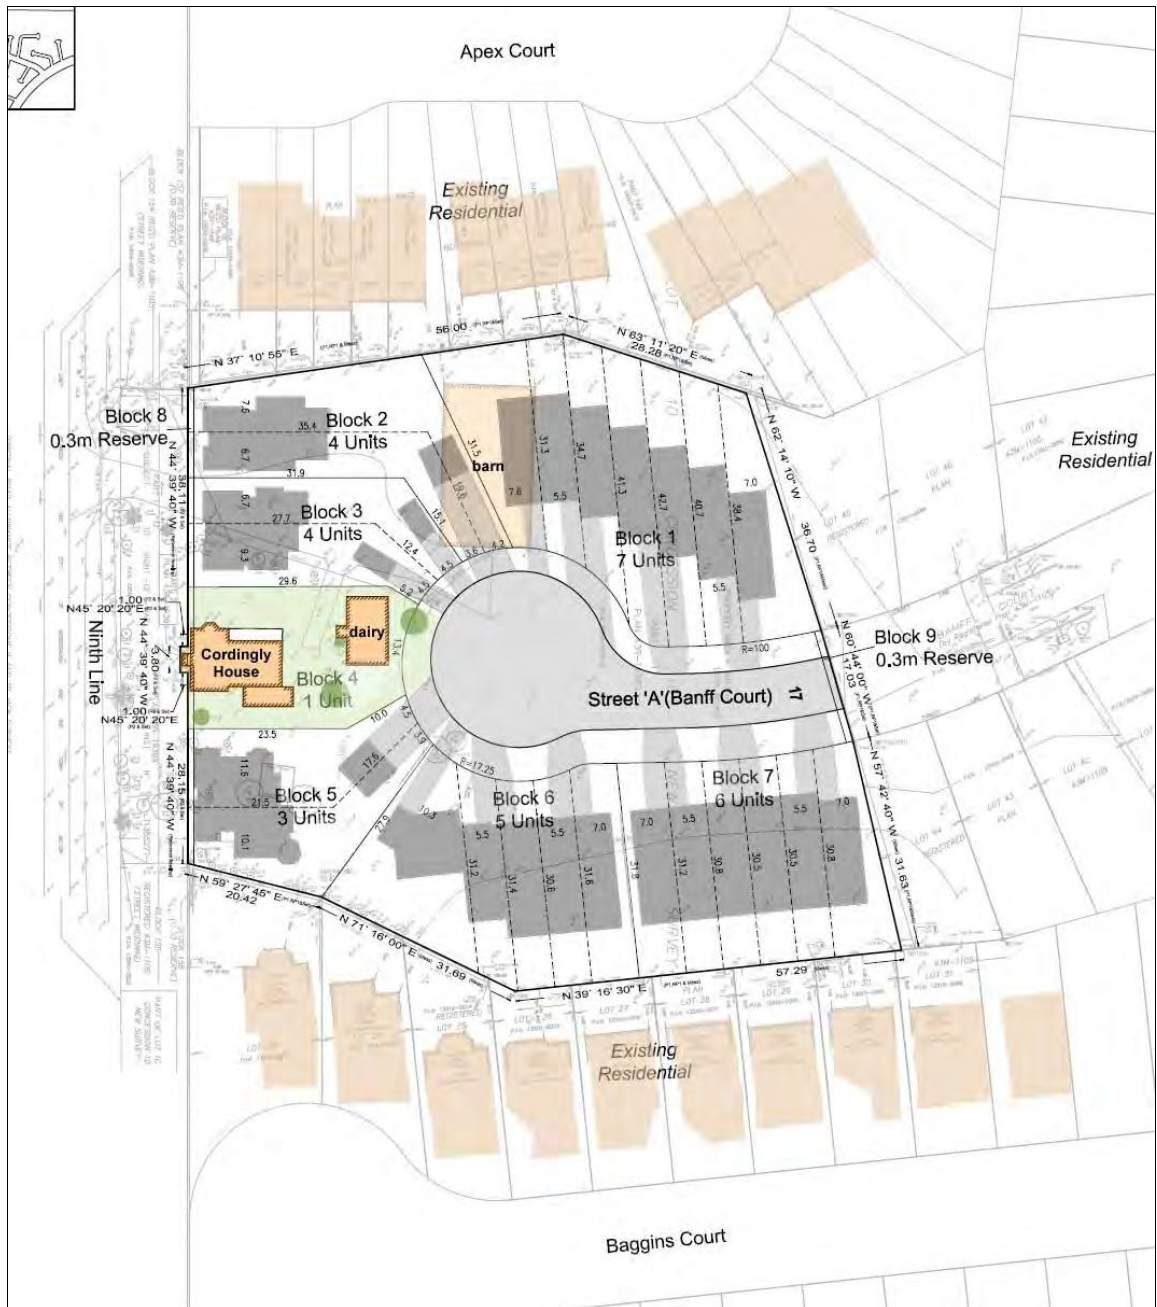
Proposed development (from Draft Plan of Subdivision, July 21, 2010, Korsiak & Company)
